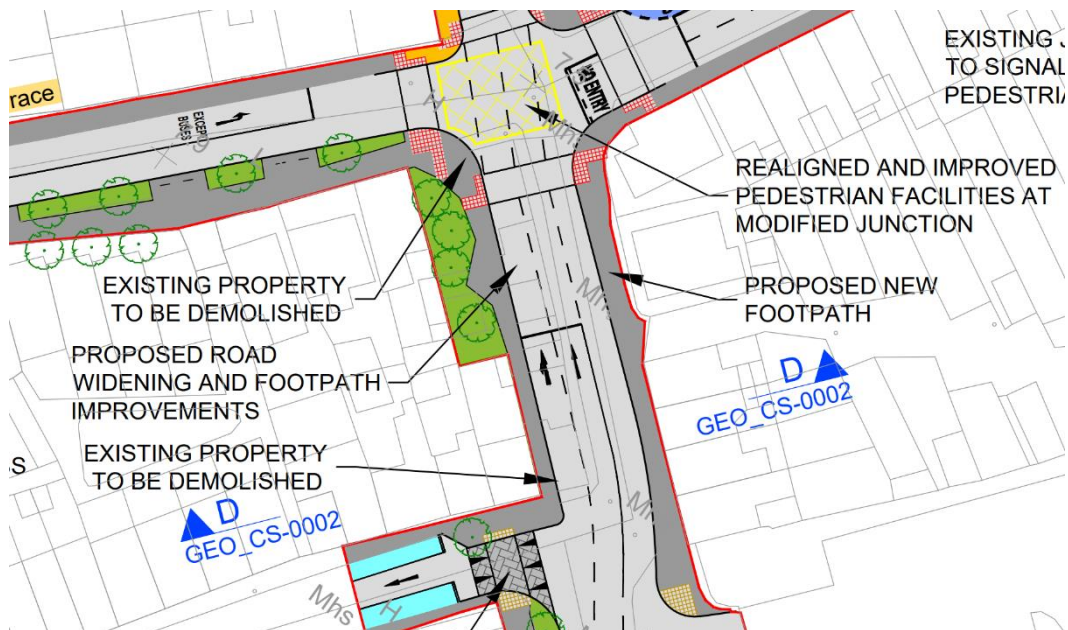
General Arrangement of Proposed Scheme at 5/6 Headford Road and 20 St. Brendan's Avenue
